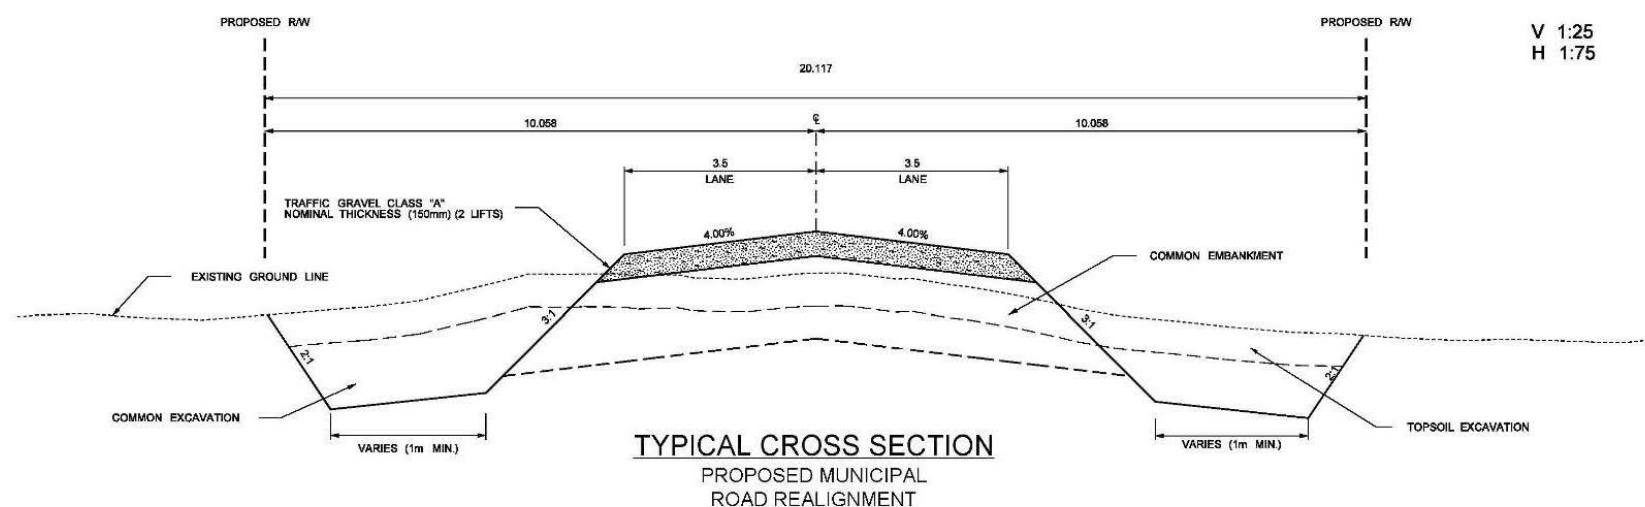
C-13 Typical Municipal Road and PR 239 Realignment Cross-Sections
